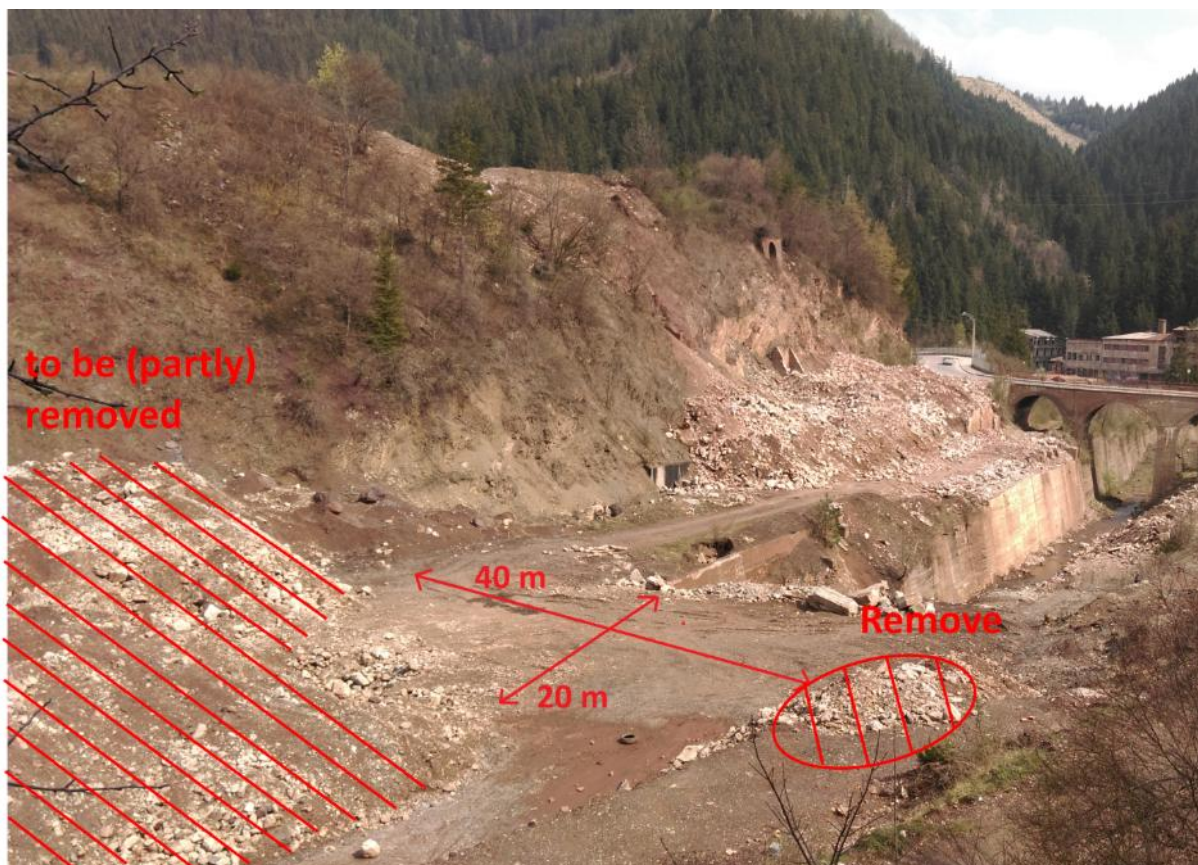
Proposed location for dewatering plant just south of 'South Beach' (photo)
